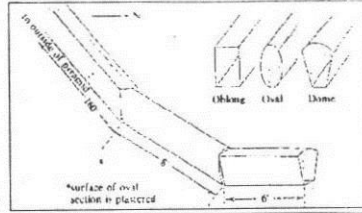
, sections of air shafts connecting the chambers to the exterior.
